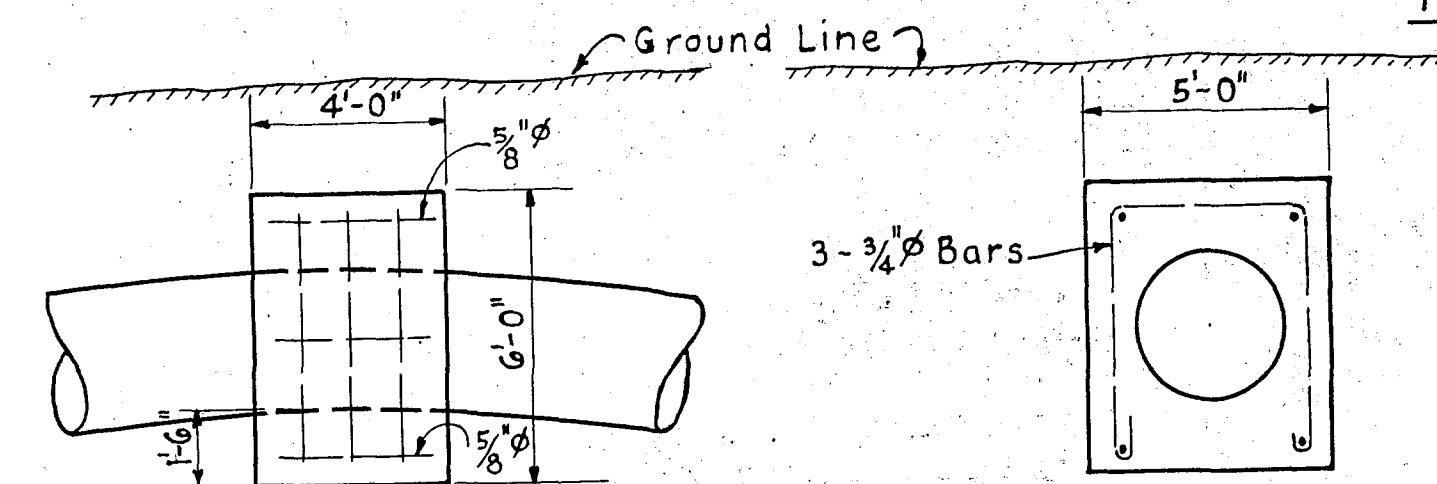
DETAIL OF AIR VALVE CONNECTION TO CONCRETE PIPE
